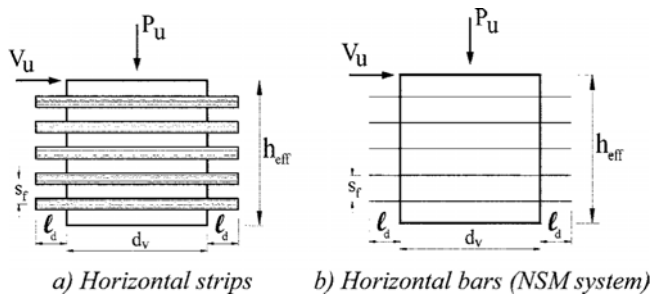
Fiber-reinforced polymer strengthening of shear-controlled walls.
